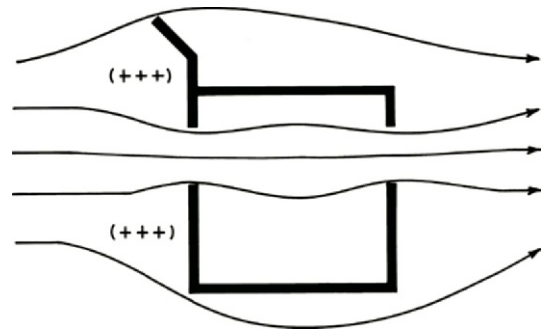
A fin wall can be used to direct the airstream through the center of the room, as seen in this plan view.
